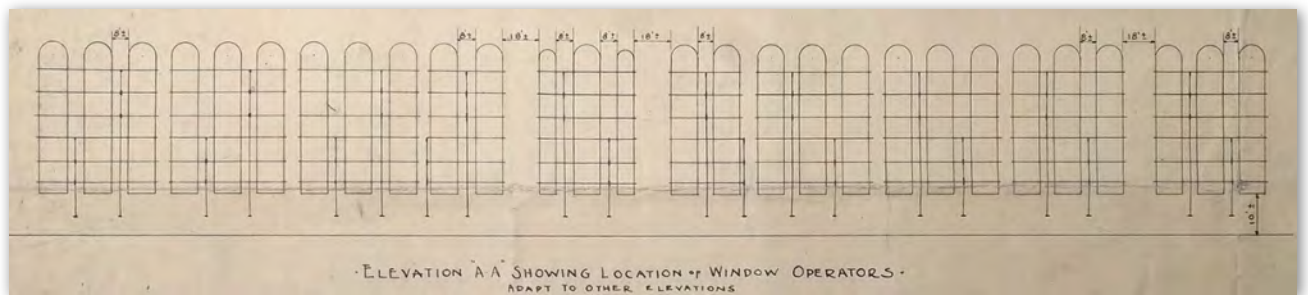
Another excerpt from the same drawing set shows the spacing of windows and the locations of the mechanical operators for half of a long elevation of the building (SCI-Pittsburgh Facilities Archives).
